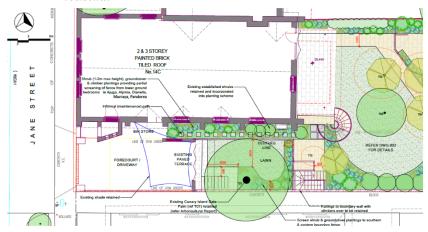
Landscape Plan - West (Hazelwood landscape architecture)
